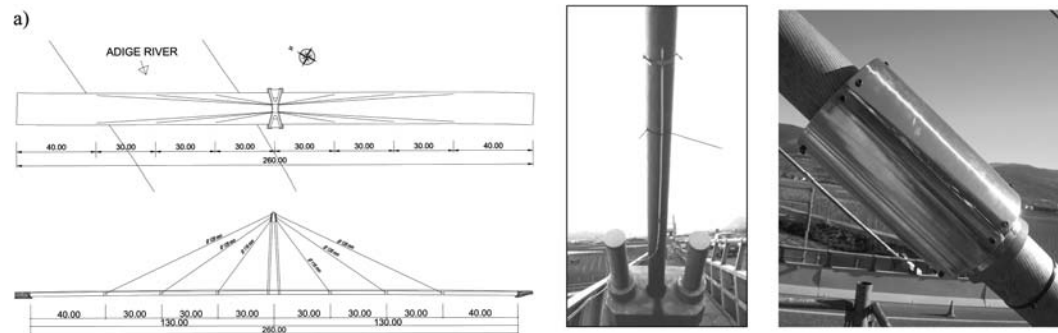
Plan view and elevation of Adige bridge; view of FOS strain sensor and EM load sensor on cable.
